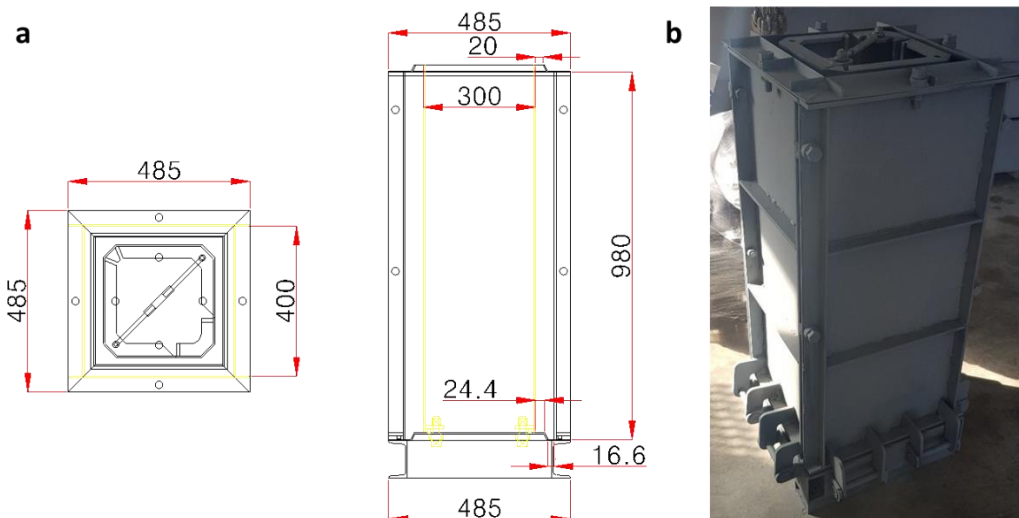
(a) Mold design for TRC site-in-place form; (b) Mold production for TRC stay-in-place form
